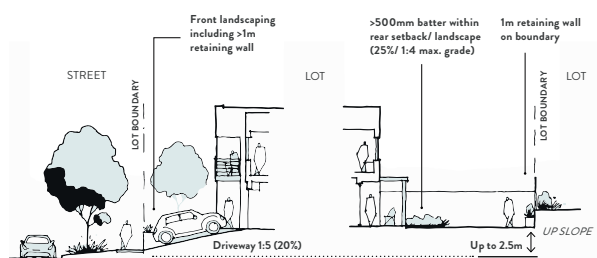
| Slope Response E - Retained Lot/ Slab on Grade Home: Front to Back Slope (up to 2.5m)
